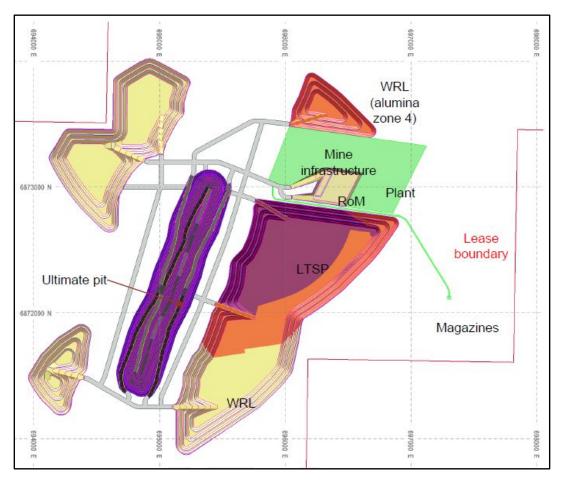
Overall mine layout with final pit design. WRL: Waste Rock Landform, LTSP: Long Term Strategic Stockpile
